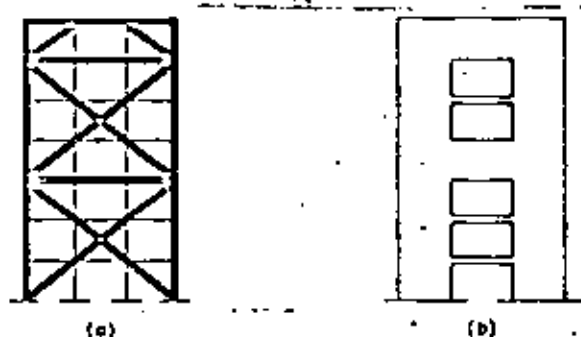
Efficient use of stiffening elements. (a) cross braces, (b) shear walls and spandrel beams
